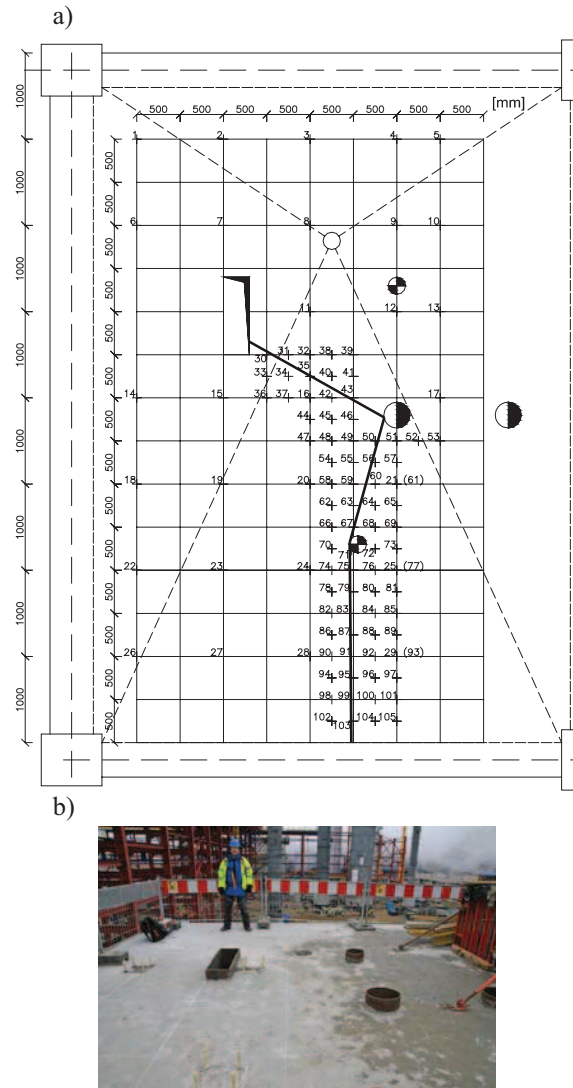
Concrete floor slab: a) geometry and measurement points; b) the photo
